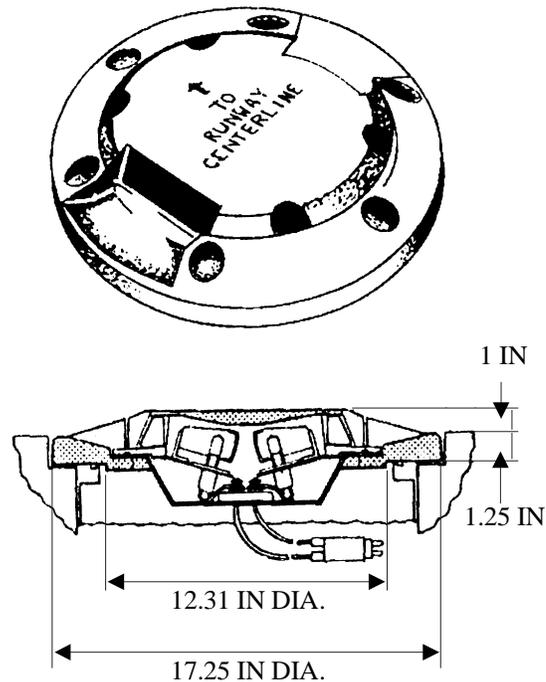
Typical plan for installation of high-intensity runway edge lights (HIRL)
